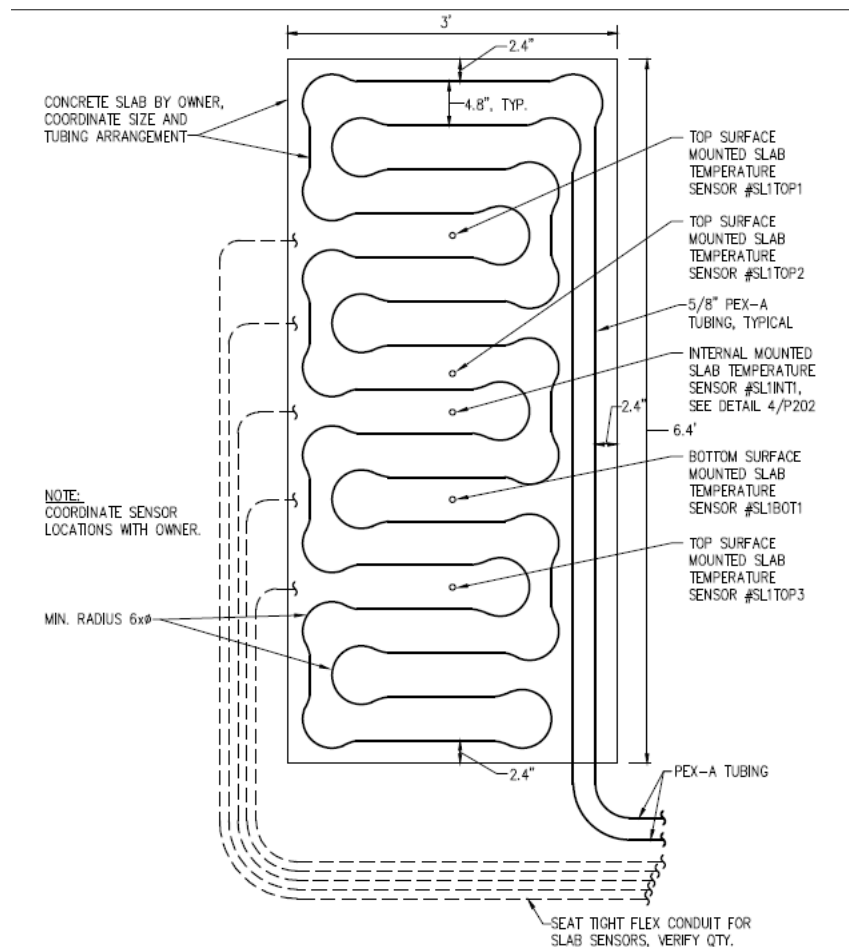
Pipe layout for hydronic heating pavement in design
